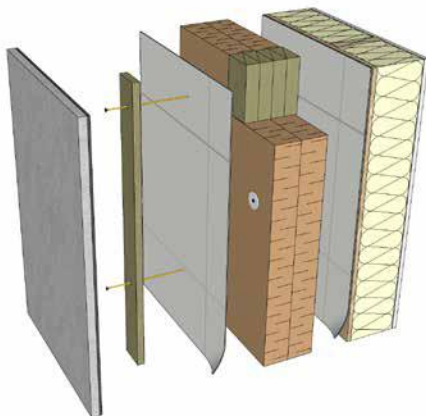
Preservative-treated deflection blocks installed at the top edge of the flashing can be used to limit deflection and support heavier-weight claddings if needed.
